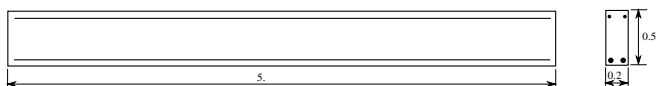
3-point bending beam cross section (just the horizontal rebars are drawn).
